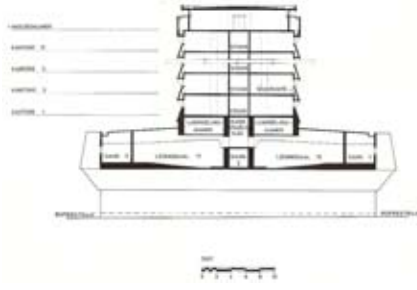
Partial section through Humanities building indicating structural elements. [Planning 22,1977]
